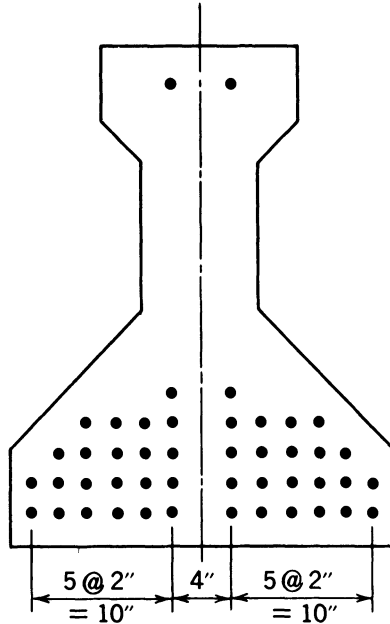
Cross section of a pretensioned beam showing tendon spacing to facilitate placing and vibrating concrete.
